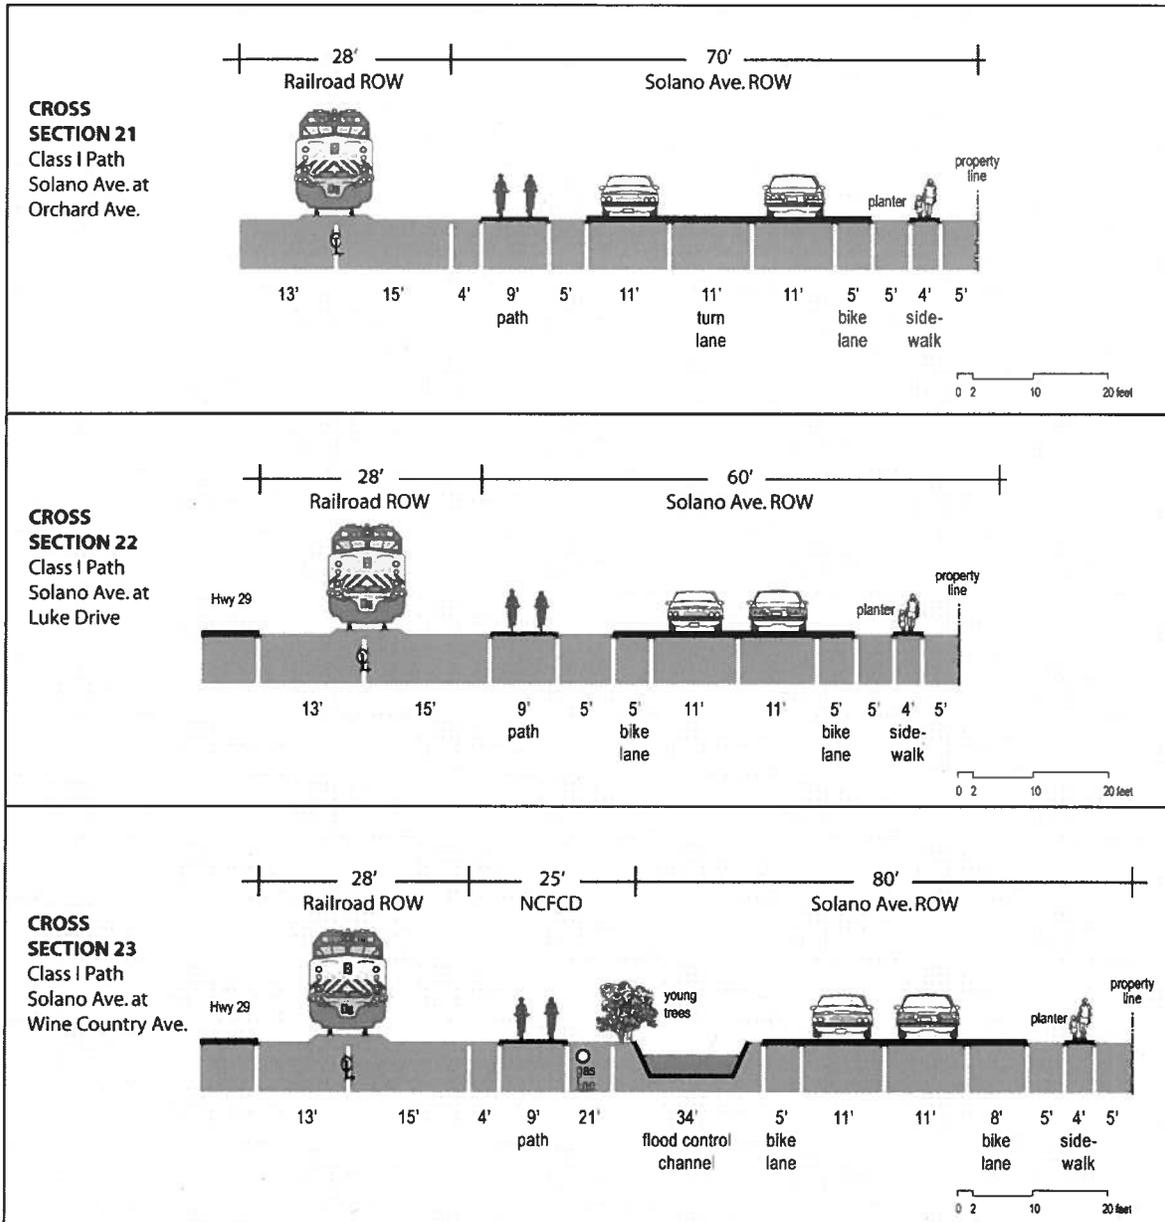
Napa Valley Greenway Typical Cross Sections
